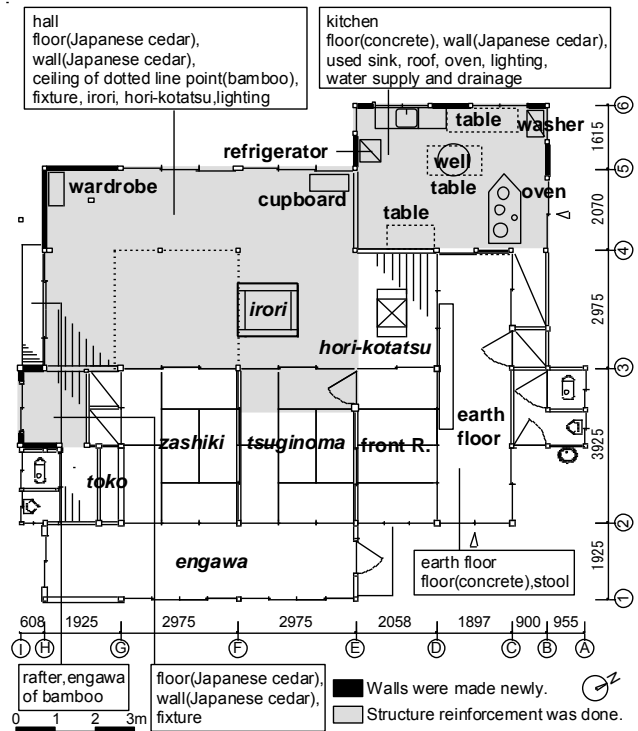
Floor plan after a repair and repair contents about interior and facilities
